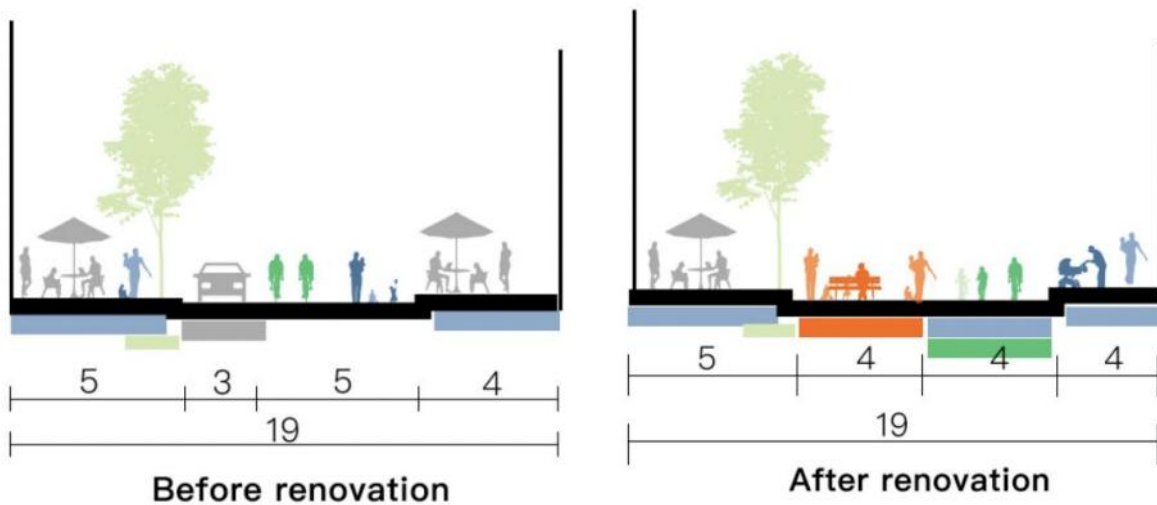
Section of Hongqiao Street before and after renovation (Drawn by author)
